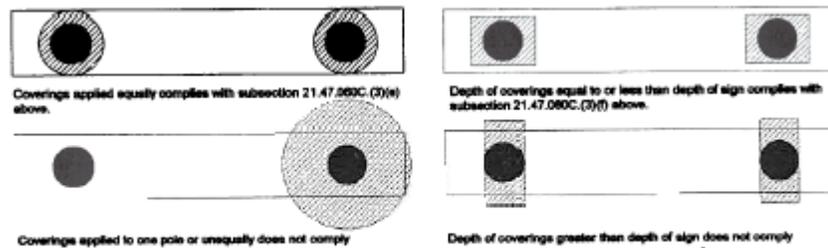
Examples of pole wrap. Poles depicted in plan view.
